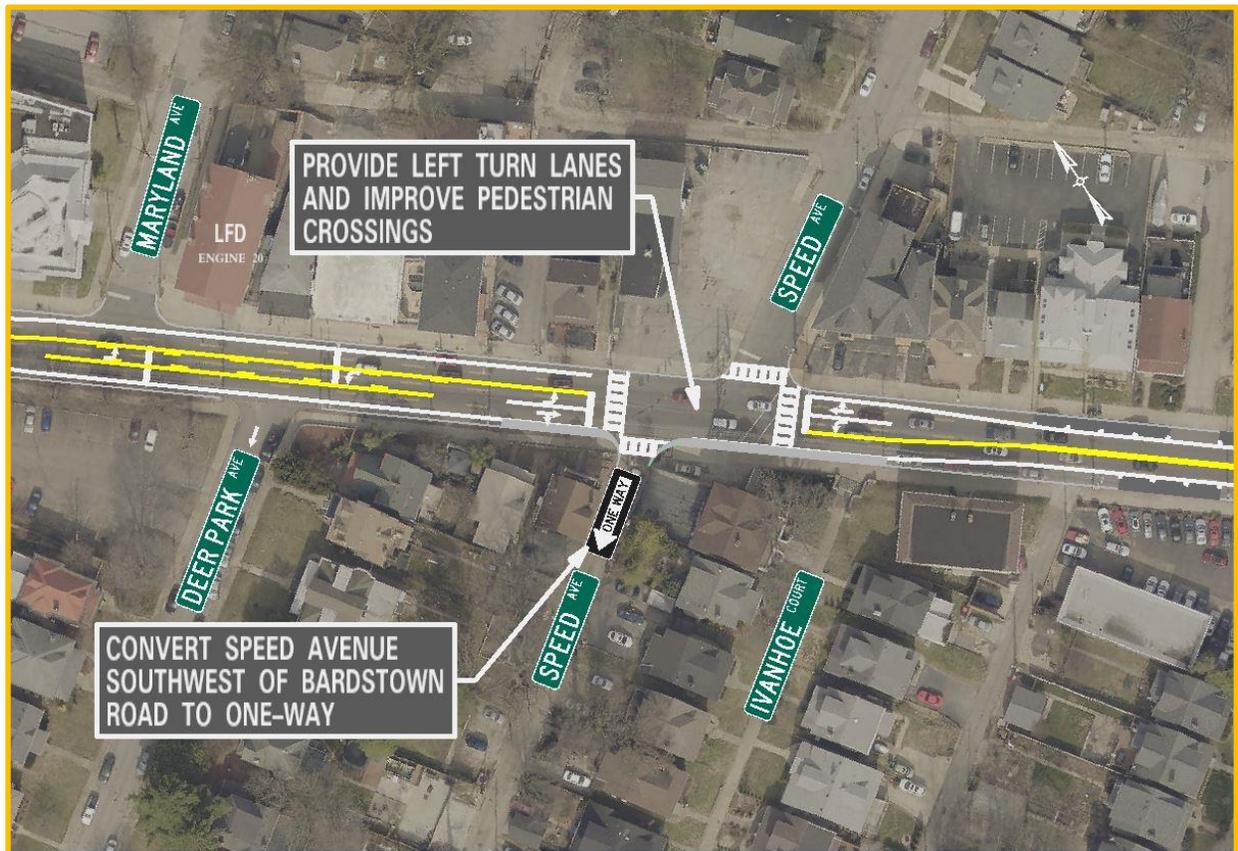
Bardstown Road at Speed Avenue—Proposed Configuration
